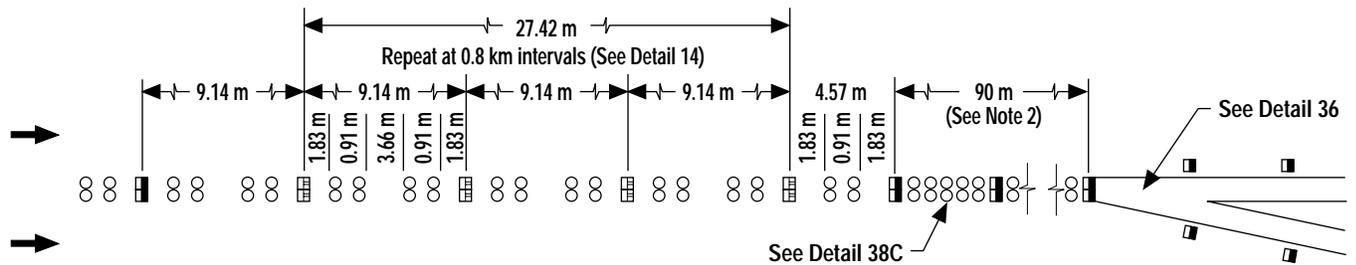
Lane Drop Markings at Exit Ramps
